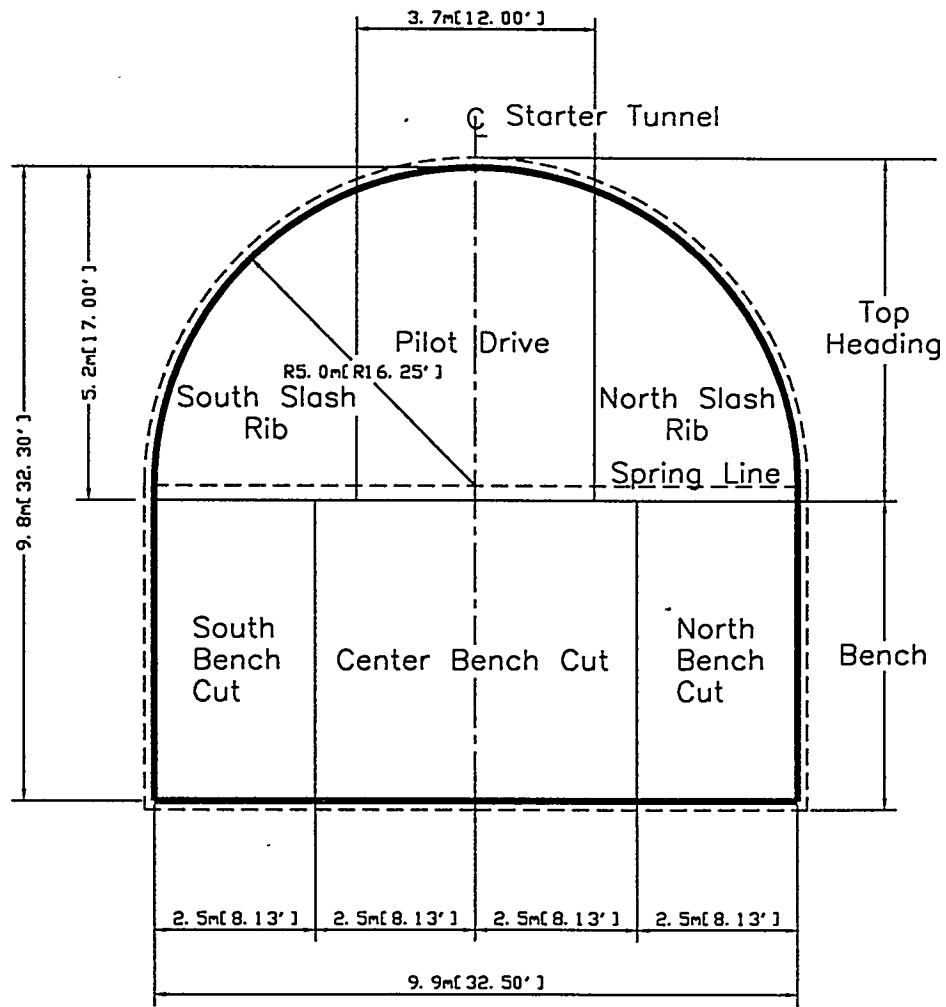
Cross section of starter tunnel illustrating top headings and bench configuration (from ESF Package 1A, YMP-025-1-MING-MG135, Rev 3).
